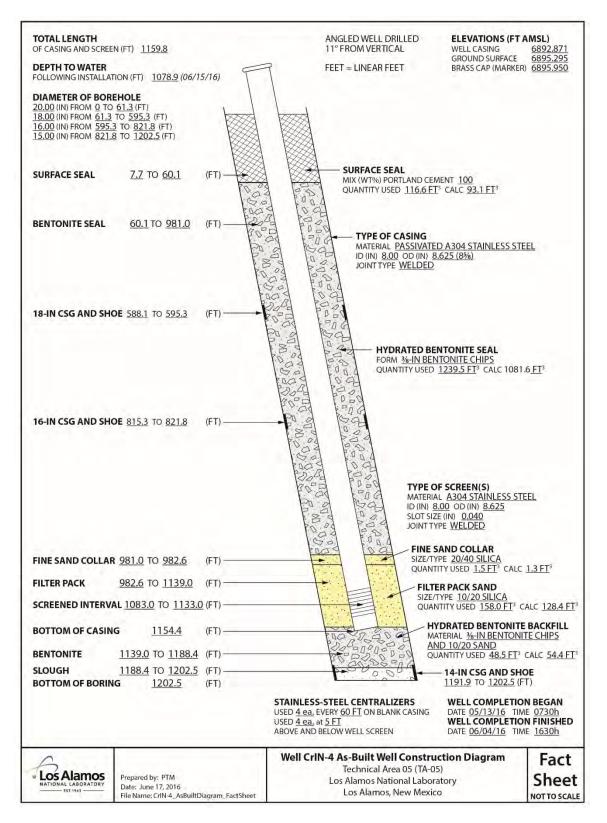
Injection well CrIN-4 as-built well construction diagram
